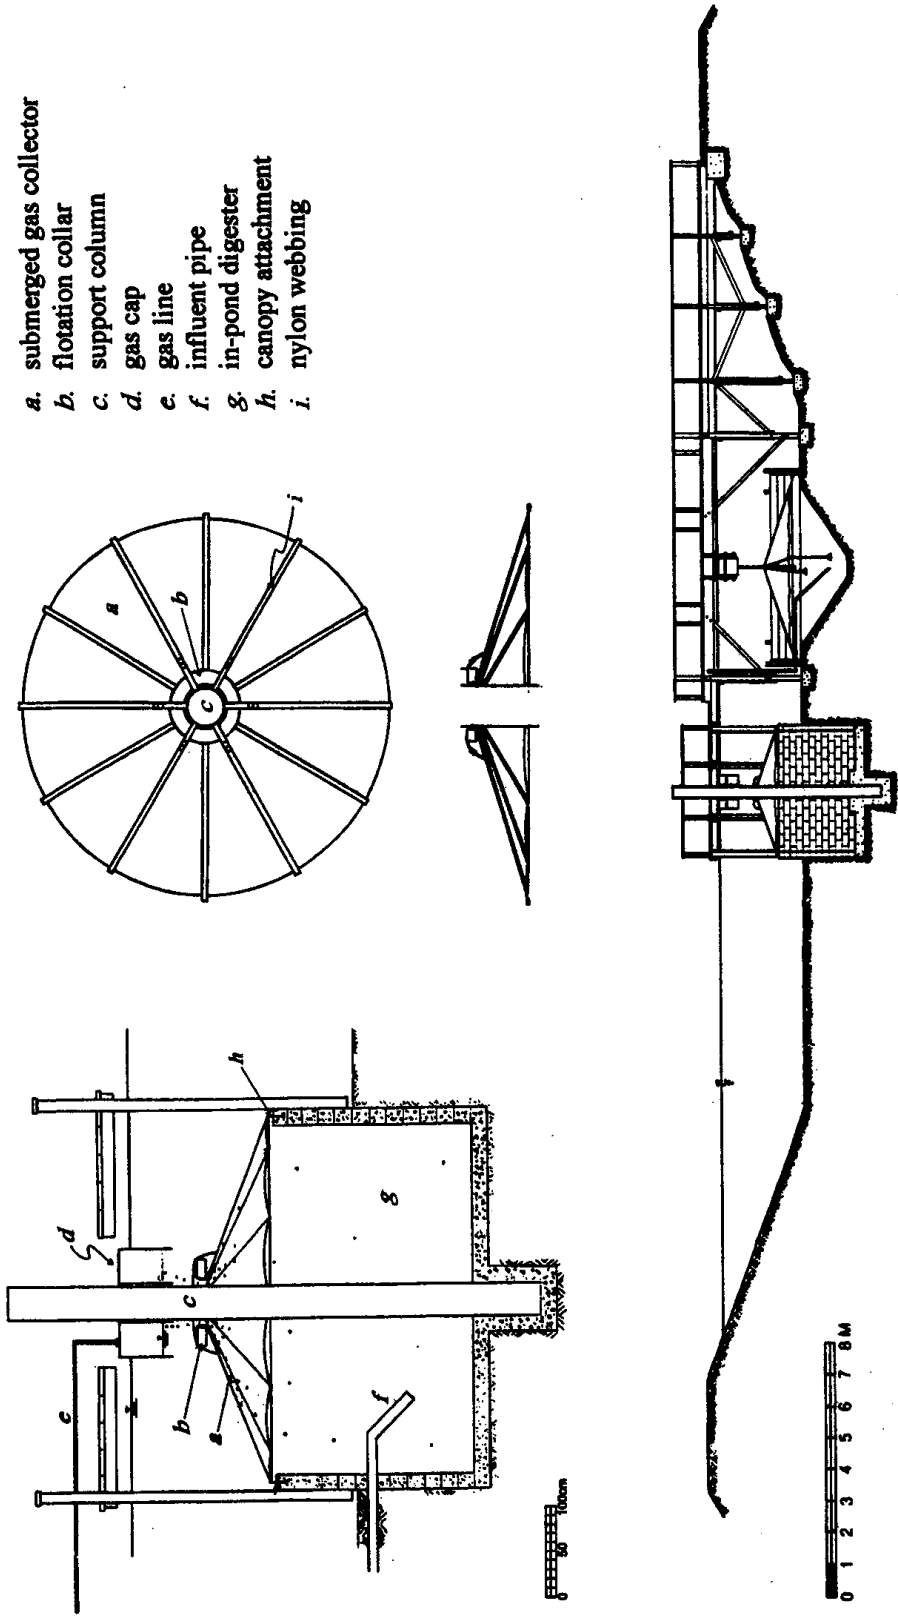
Cross section of the Advanced Facultative Pond showing both digesters, submerged gas collectors, sampling platform and bridge with details of the first digester, and submerged gas collector.
